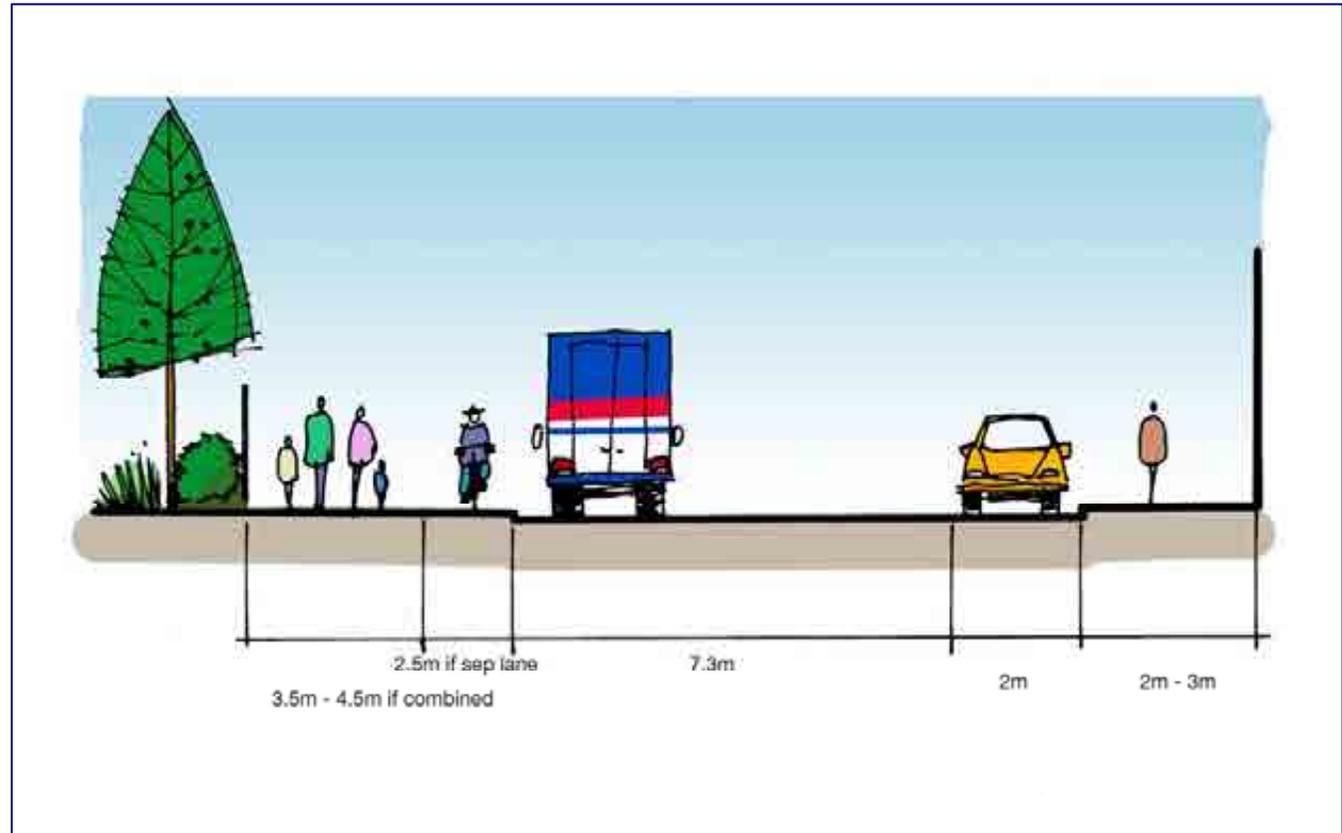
Cross section to show typical layout of the east-west Spine Road.
